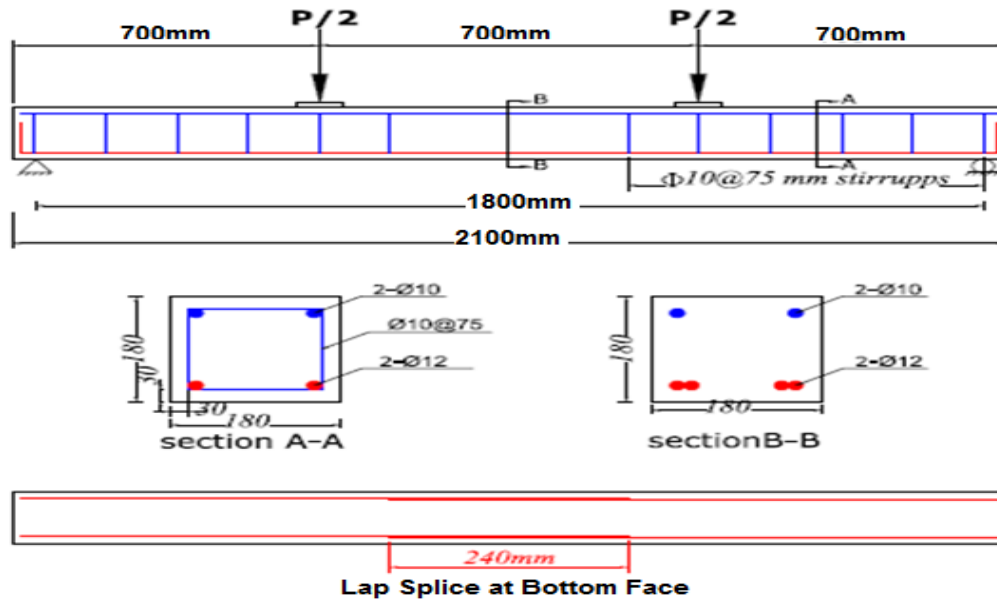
Geometry Details of Beam (B-R.), (all dimensions in mm)
